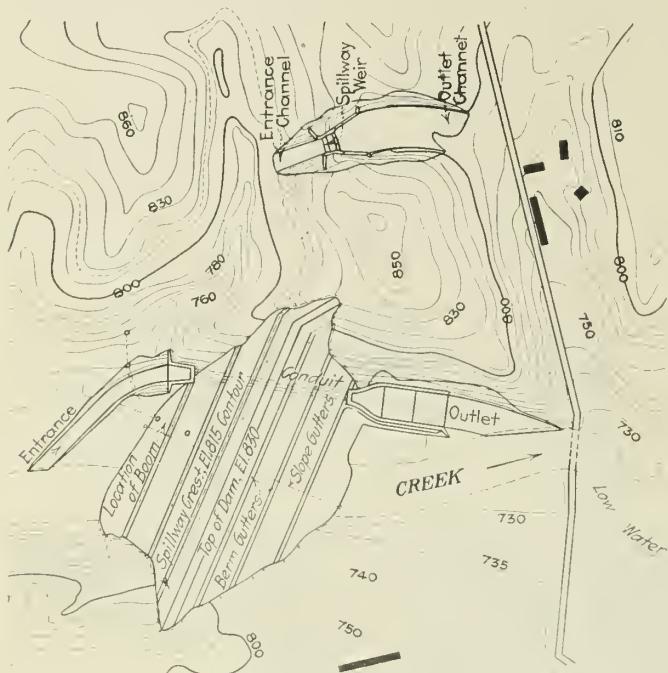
PLAN OF GERMANTOWN DAM, SHOWING SEPARATE SPILLWAY
